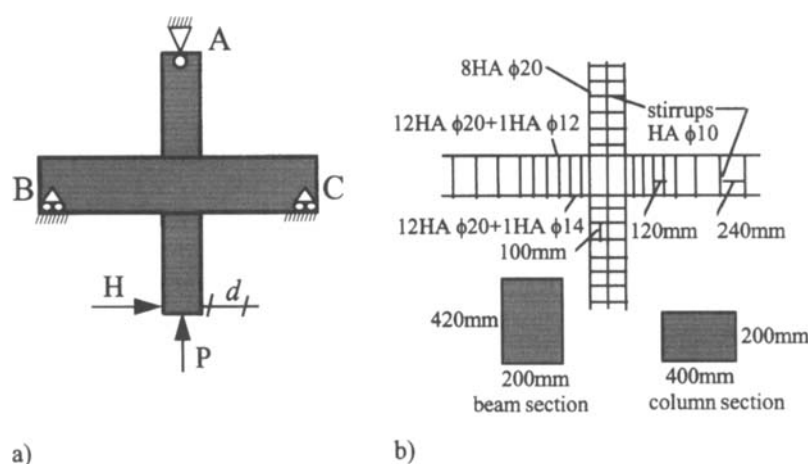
Interior beam-column joint of a RC frame: (a) Boundary conditions, (b) reinforced layout
